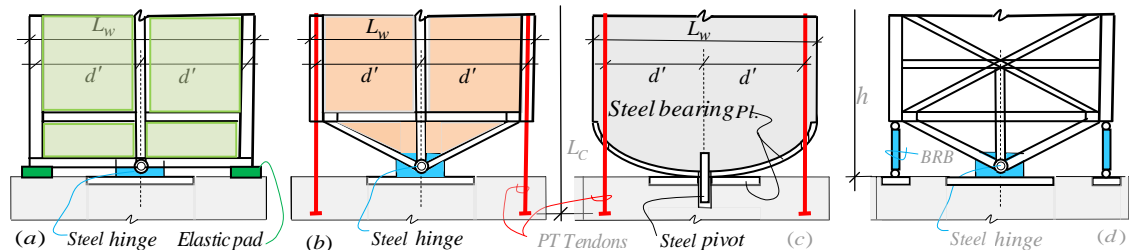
(a) Plywood RRC, (b) Steel plated RRC, (c) Reinforce concrete RRC, (d) Braced frame RRC+BRBs
